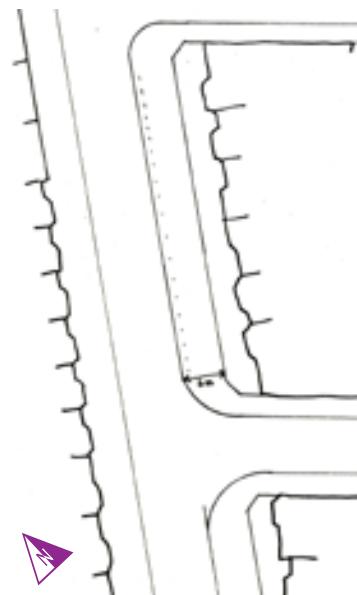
principle 1 - widening the sidewalk with 1 metre
